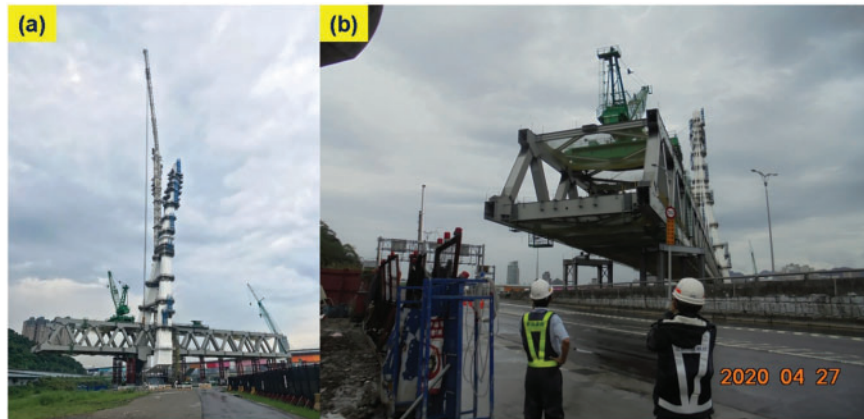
Site photographs of the TFES: (a) near the steel pylon and (b) near the P9-18 pier
